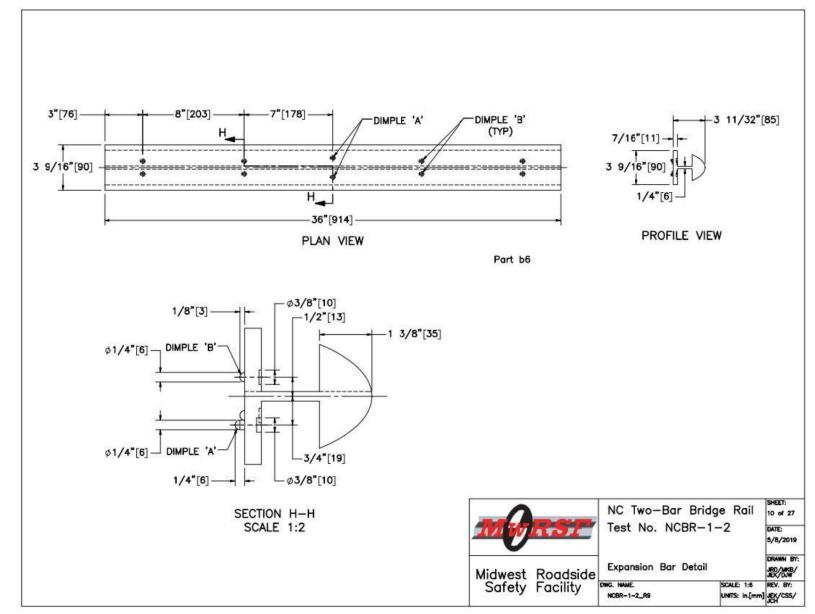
Expansion Bar Detail, Test Nos. NCBR-1 and NCBR-2
